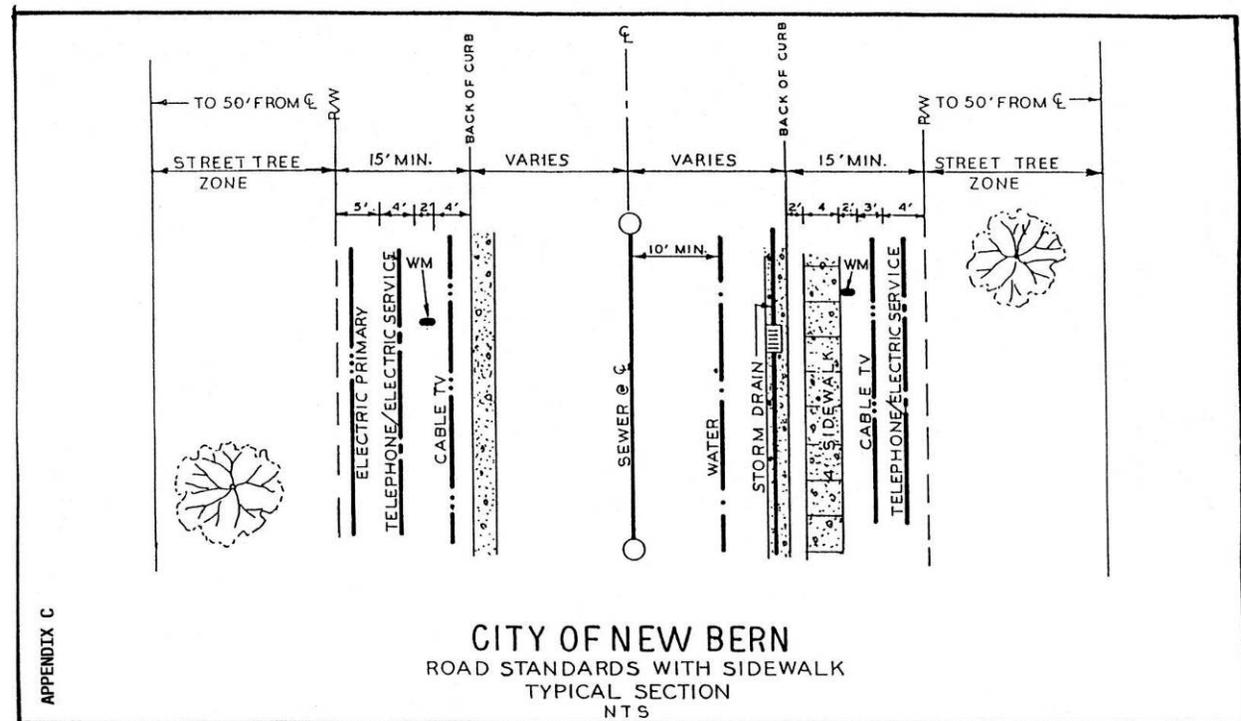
Appendix C of New Bern’s Land Use Code shows typical street section.
